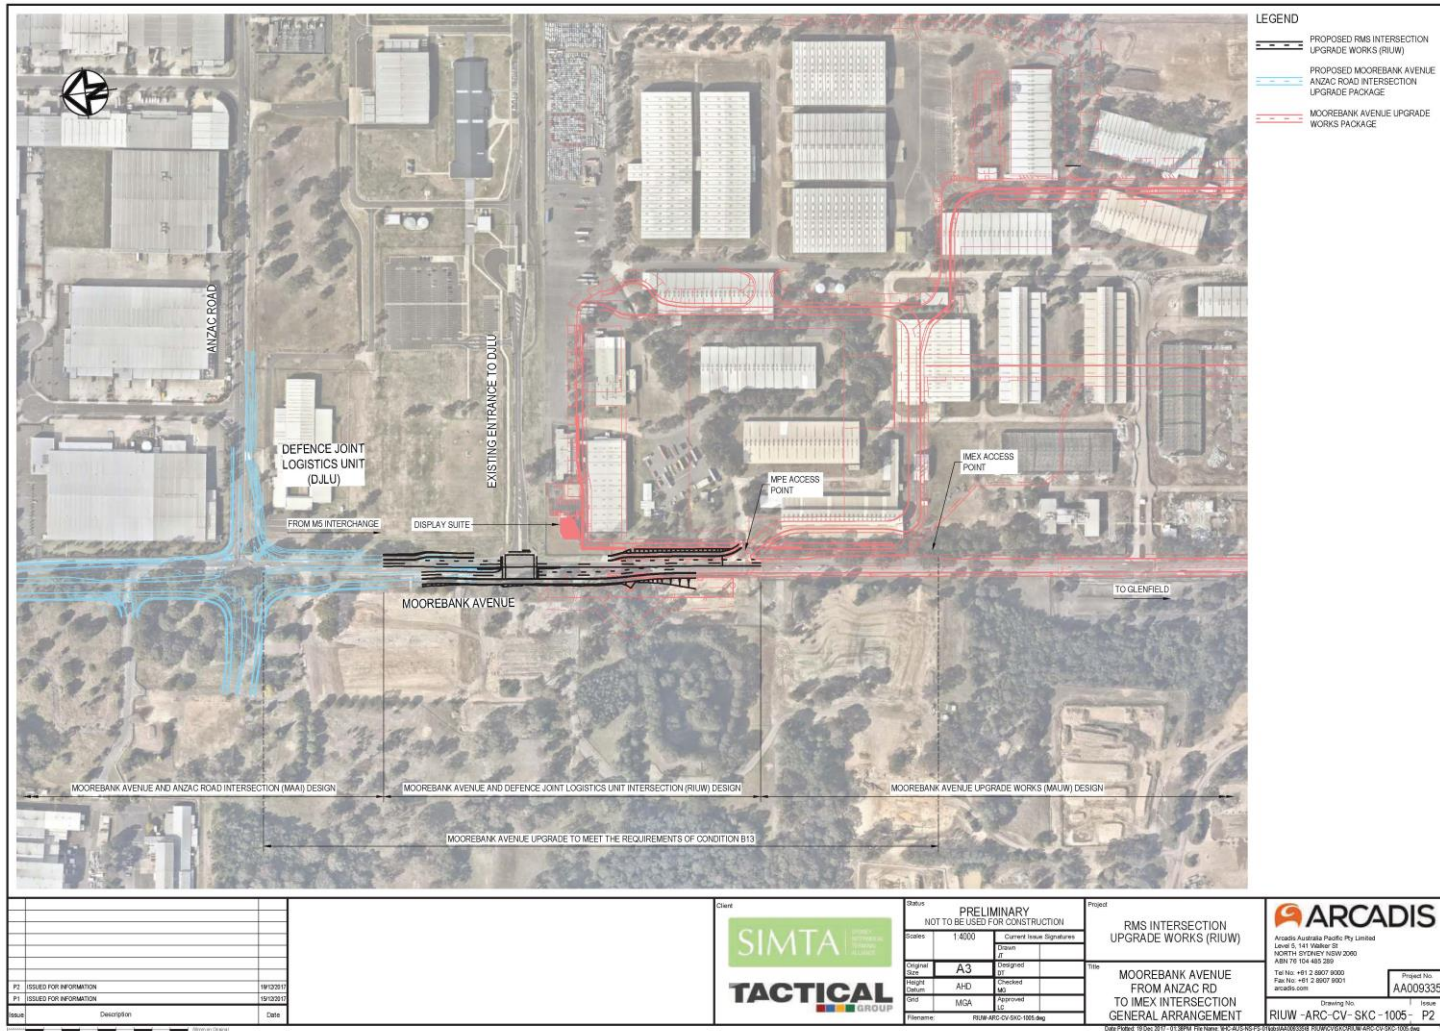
Indicative Layout Plan – Moorebank Avenue/ Anzac Road Intersection Upgrade
